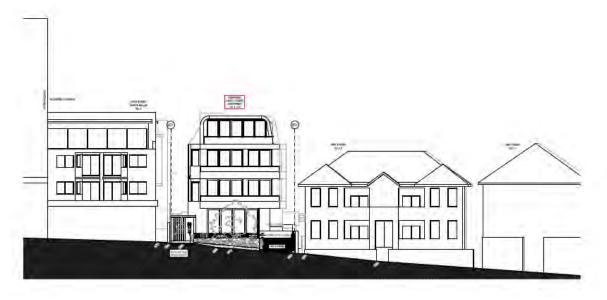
Streetscape Elevation (Source: Applicant's submission)
